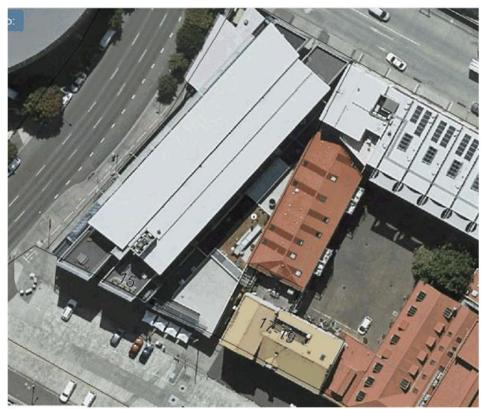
above: aerial photograph with dwelling 10 (third level of the main building) to the right hand side of the frontage to Hunter Street.
